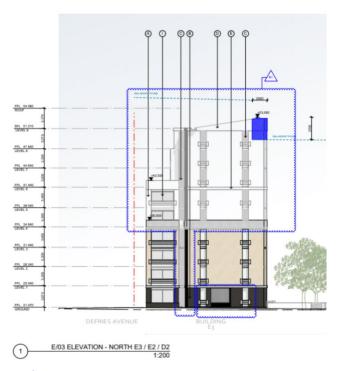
Northern Elevation of Proposed Building E3 – LEP Height Variation Coloured Blue (Source: Candalepas Associates and Lachlan Seegers Architects)
